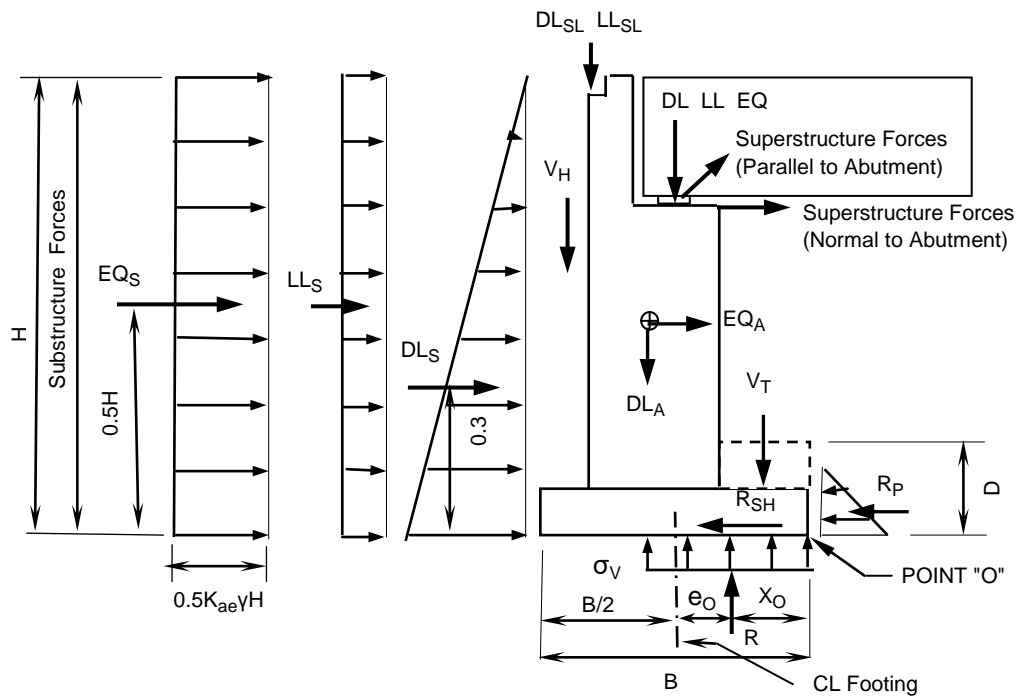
Definitions and Locations of Forces for L-Shaped Abutments and Interior Footings (modified from WSDOT, GDM)
